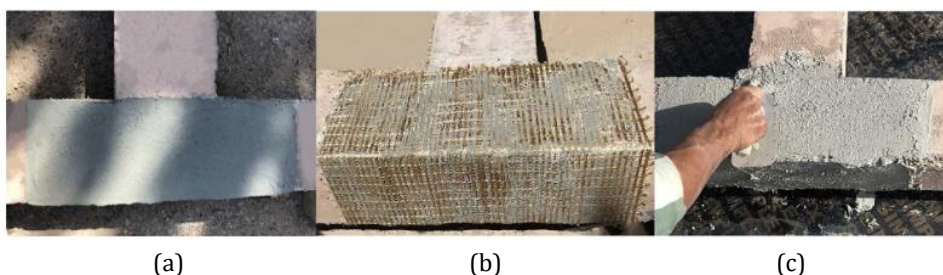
Strengthening of beam-column joint (a) Applying the first layer of binder (b) Applying the fabric (c) Applying the second layer of binder [93]
